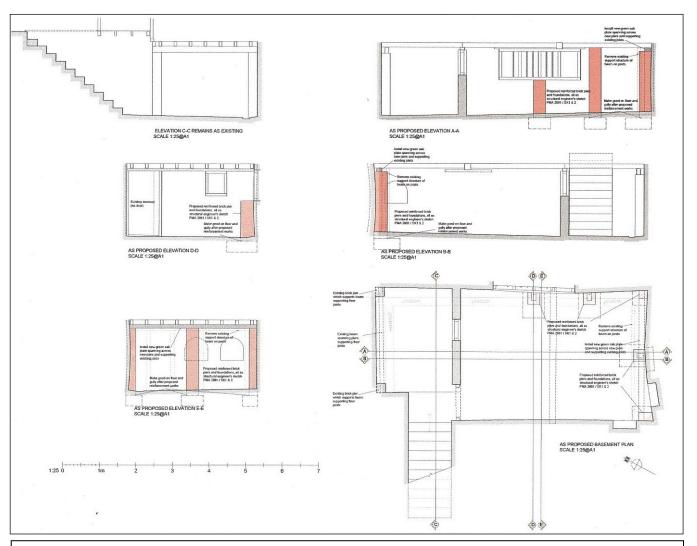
Elevations and Plan of Cellar (Adapted from Anthony Hicks Traditional Oak Buildings DRG. No. PP-1M-02)
